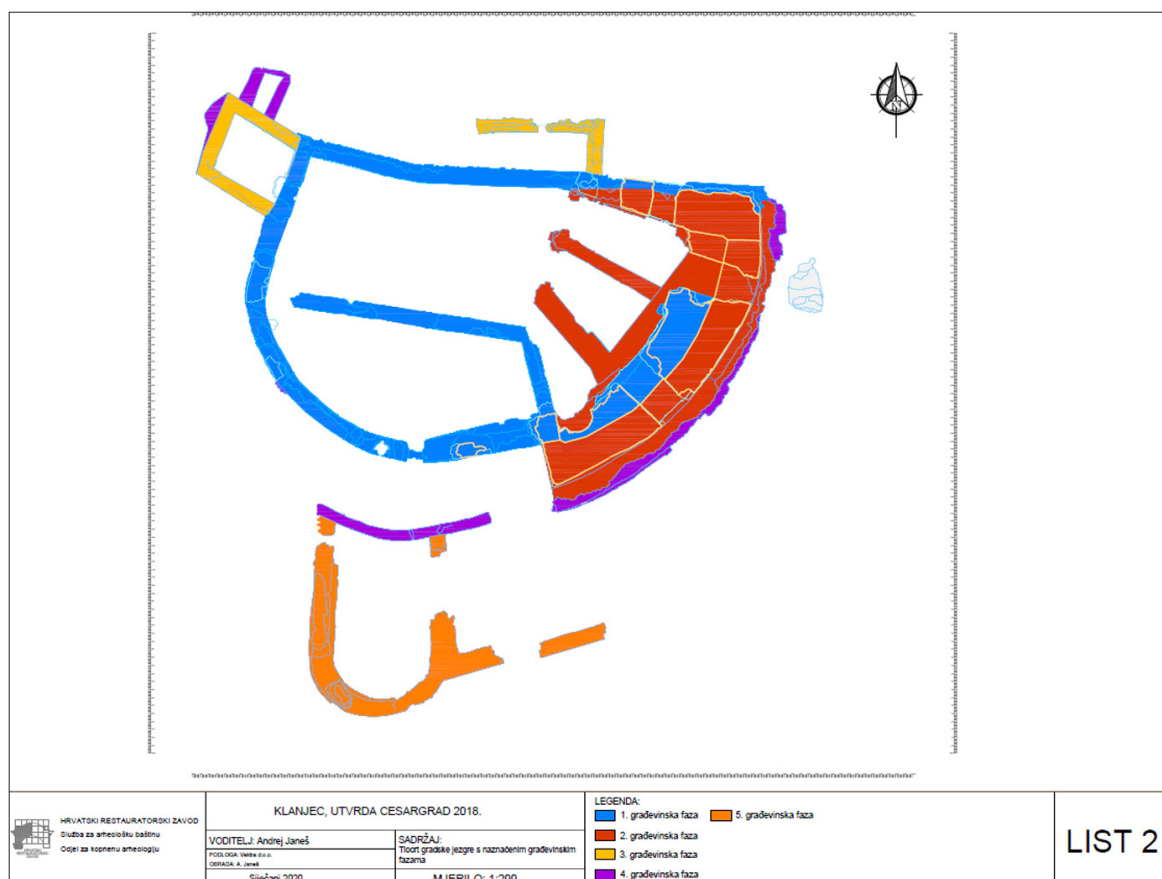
Cesargrad ground plan with construction phases (plan by: Vektra Ltd, edited by: A. Janeš).
